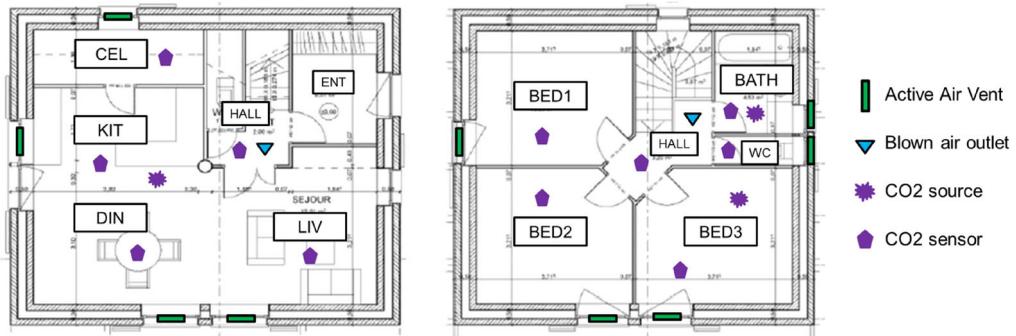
Introduction of the experimental house – Left: Plan of the first floor. Right: Plan of the second floor.
